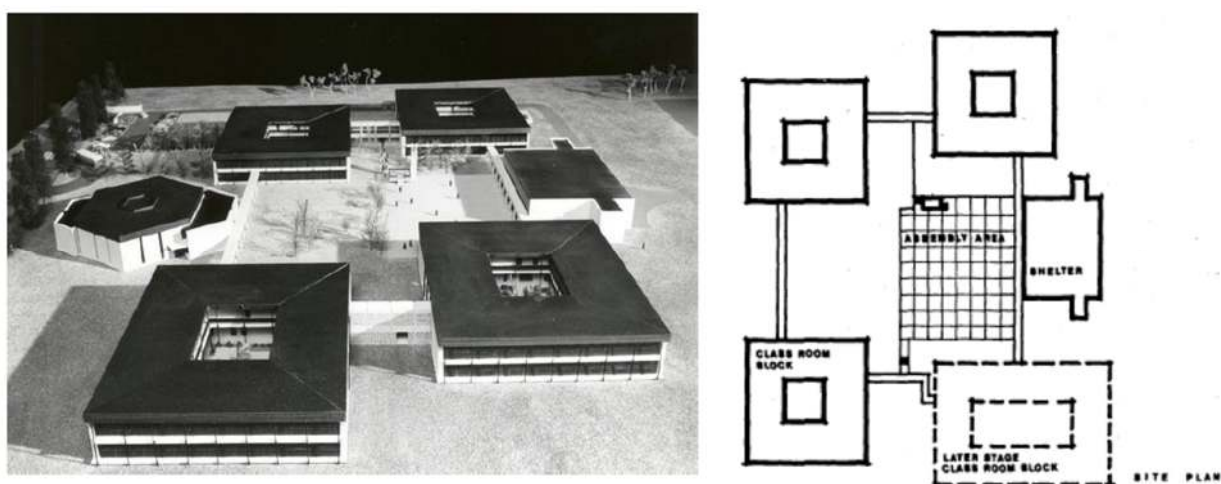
Model of a standard doughnut plan high school and plan sketch of the Ku-ring-gai High School (Turramurra High School) layout, 1964. *Source:* Tanner Denton Kibble 2018, 133.
